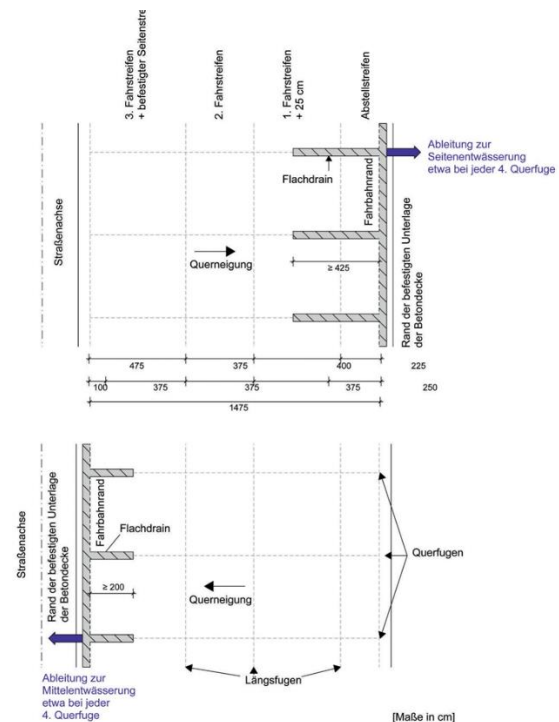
Flat drain laid on milled bituminous base under concrete pavement, Source: K. Hrapović, 2021
